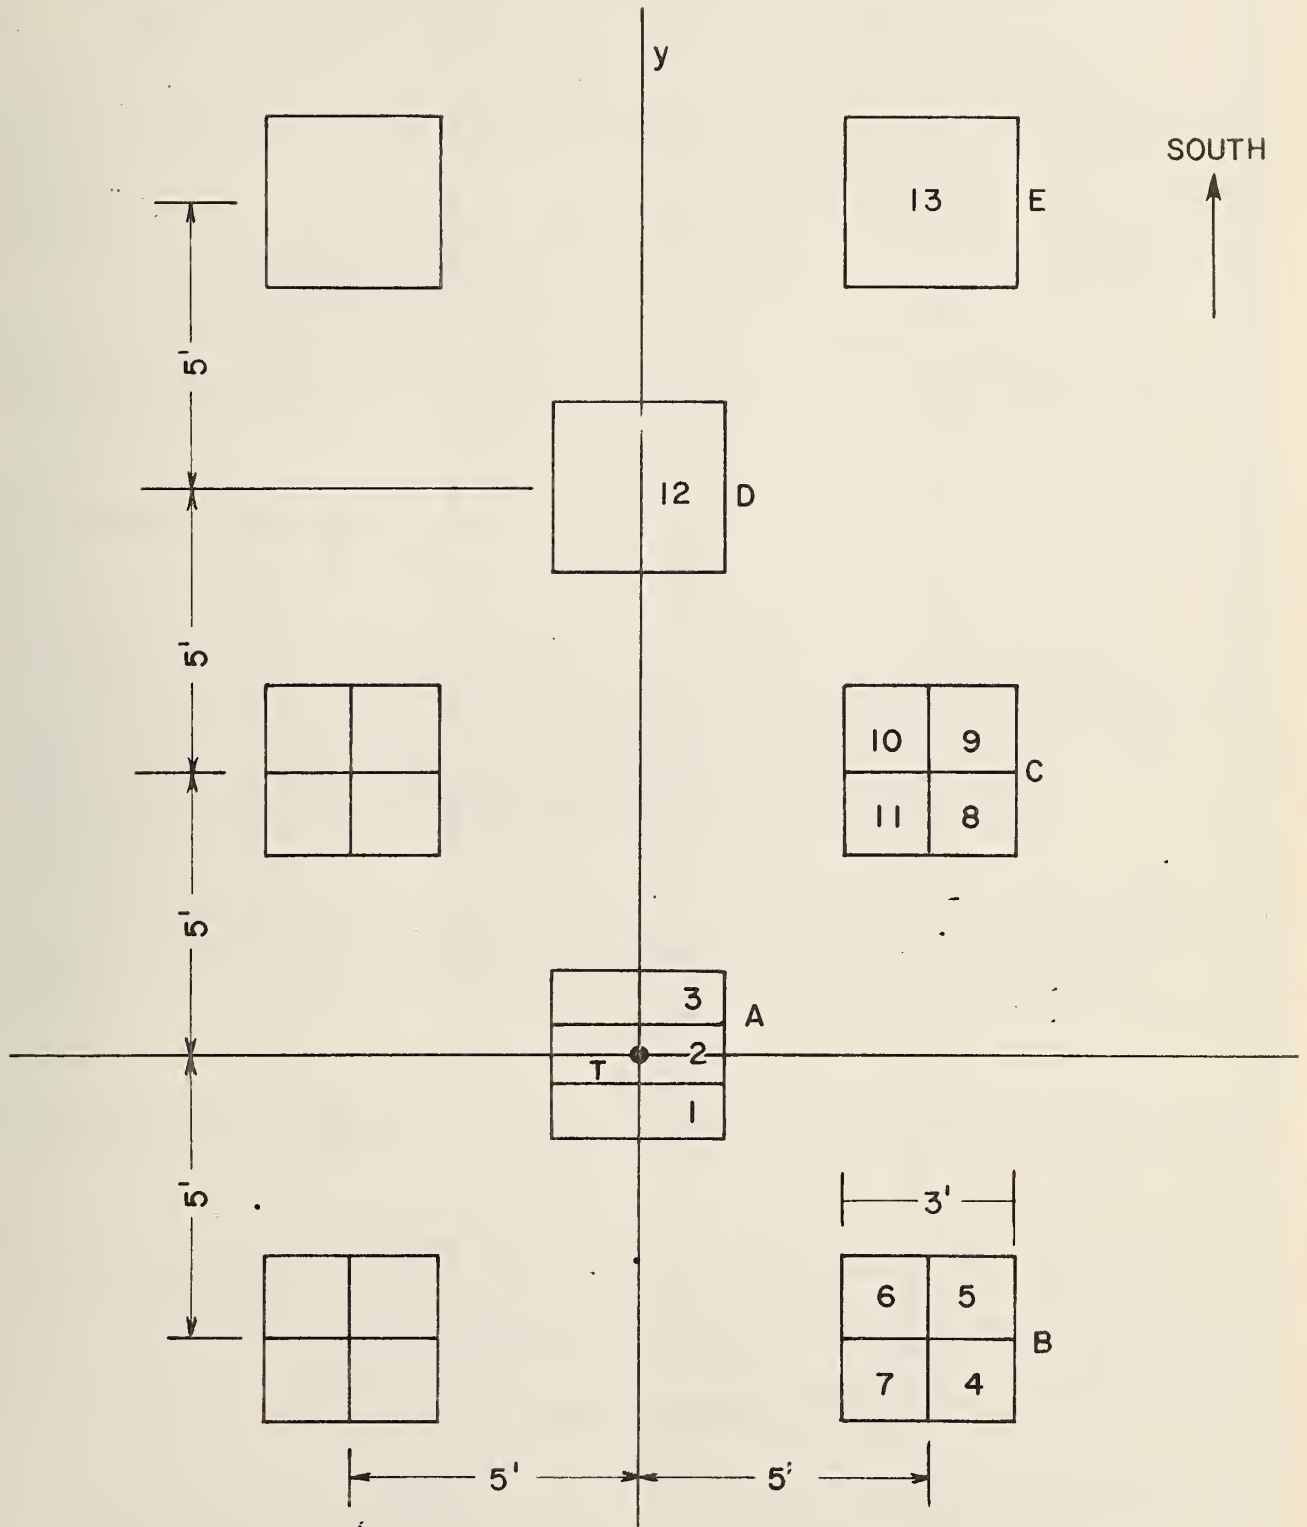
Lighting Layout Diagram for Fluorescent Batwing Installation (Strip Luminaire).
